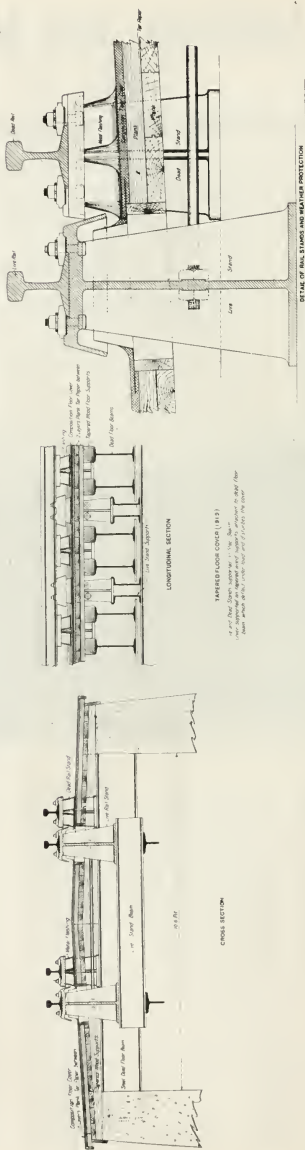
200-Ton Track Scale. C.P.R., Tapered floor cover (1919), cross section, longitudinal section, and detail of rail stands and weather protection.
